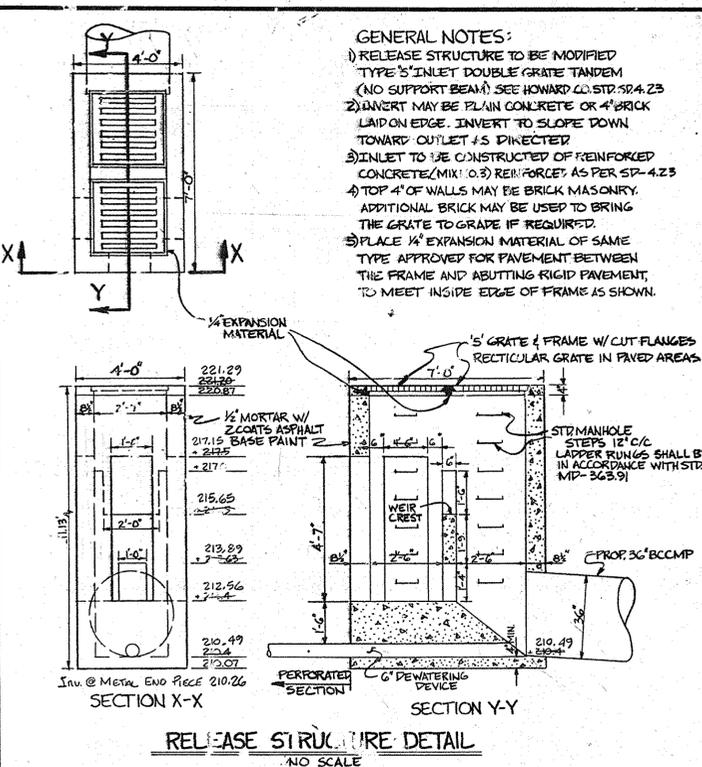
DETAIL OF UNDERGROUND STORMWATER MANAGEMENT FACILITY
